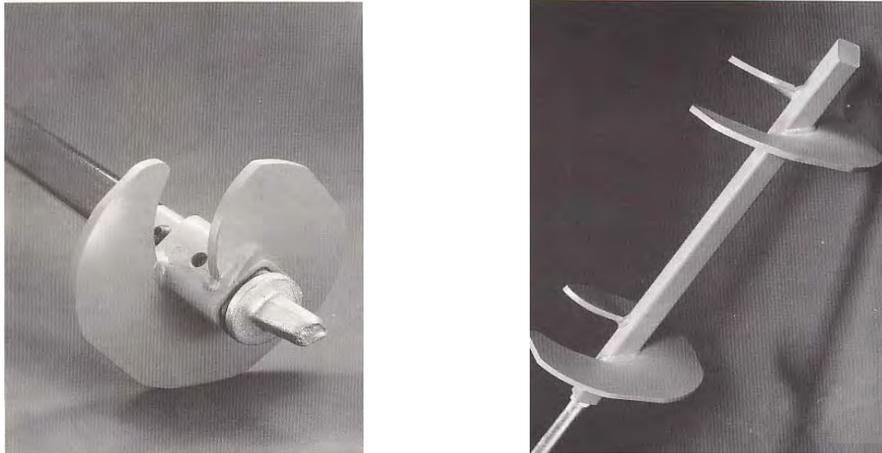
Photo for Single Helix Anchor and Multi Helix Anchor (Braja M Das, 1990)
